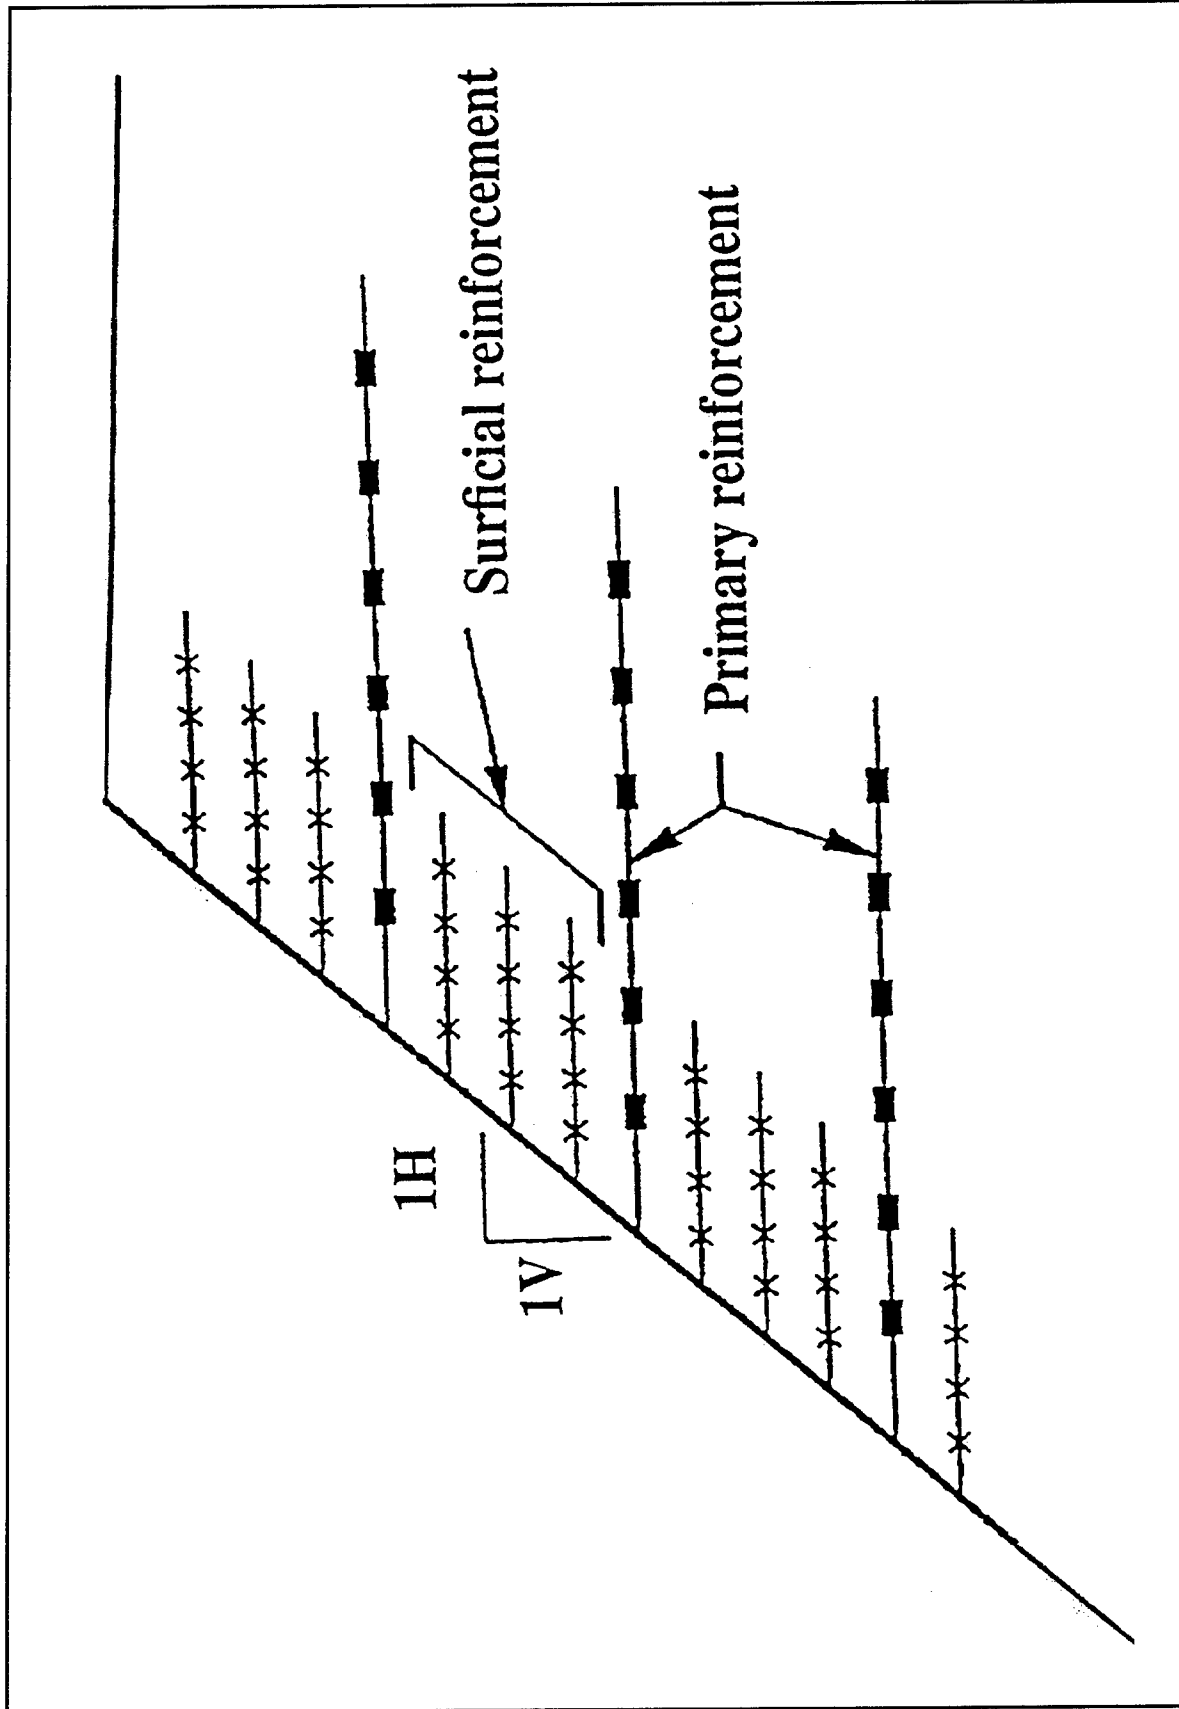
Cross section of reinforced soil slope (adapted from Collin 1996)
